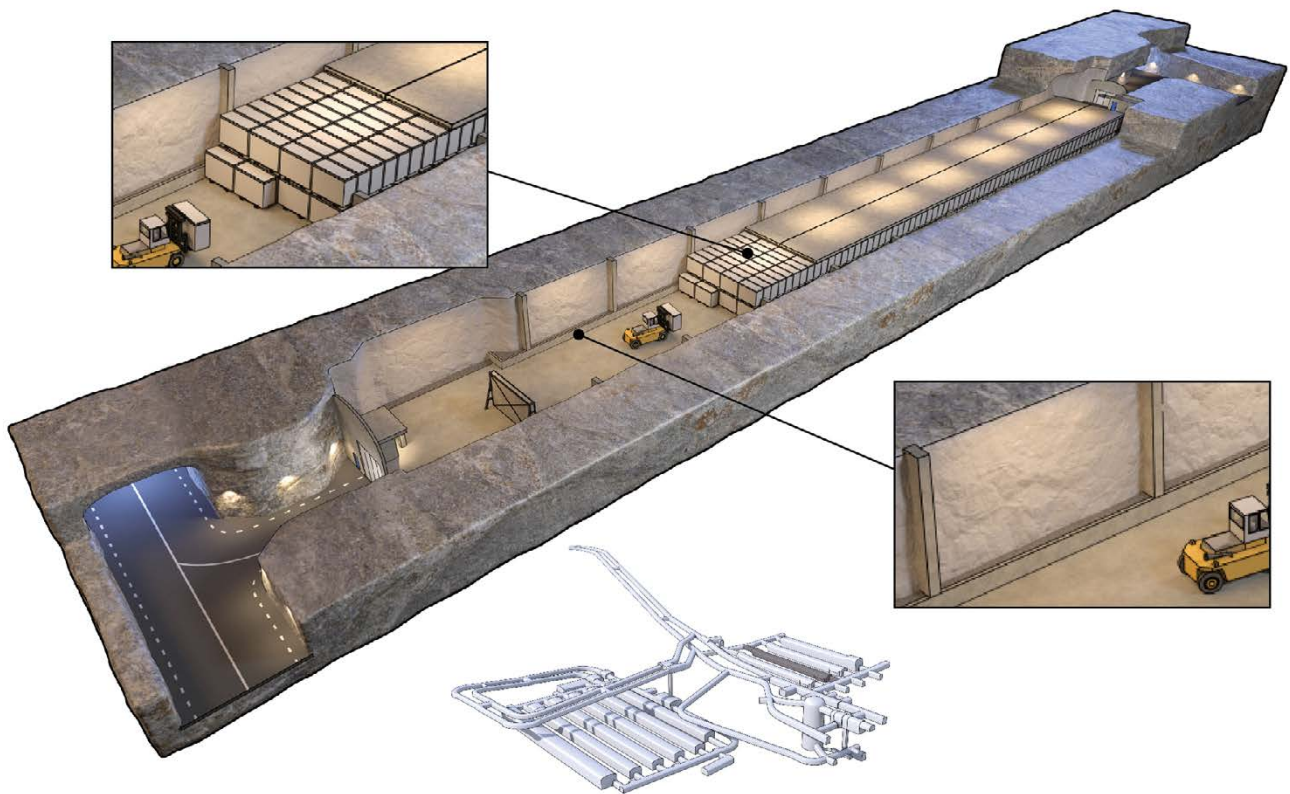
Vault for concrete tanks, 2BTF, in SFR1 during the operational period. The upper detail shows the emplacement of concrete tanks, the lower detail shows the skirting and concrete pillars. In addition, there is a view of SFR with the position of 2BTF in darker grey.
